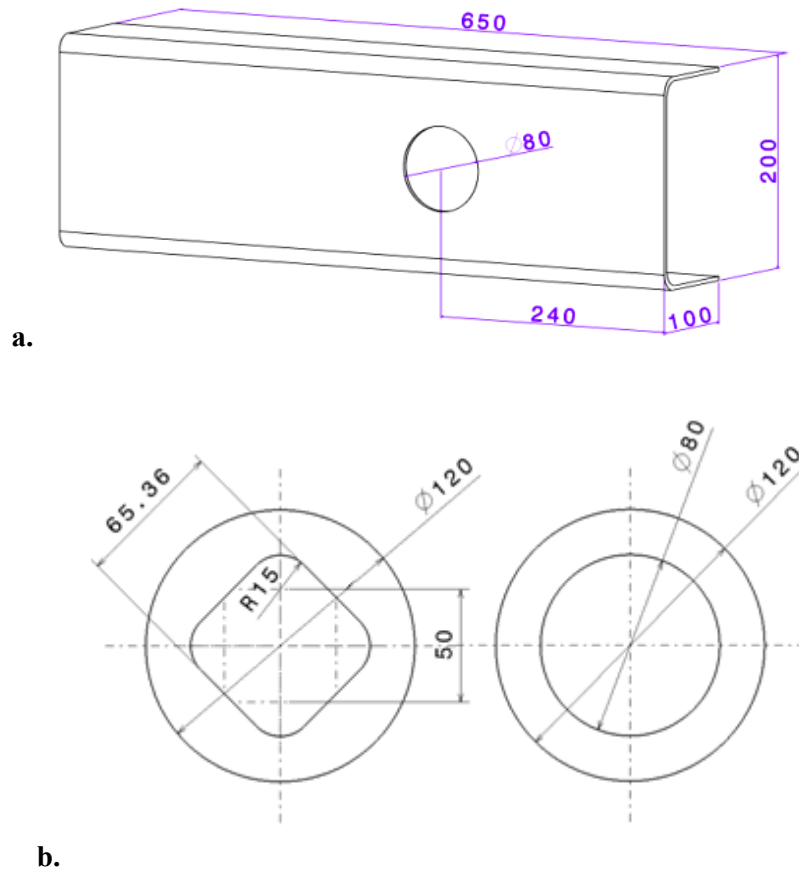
(a) A C-section beam with circular cutout; (b) Dimensions of the diamond and circular cutouts and reinforcement rings (in mm).
